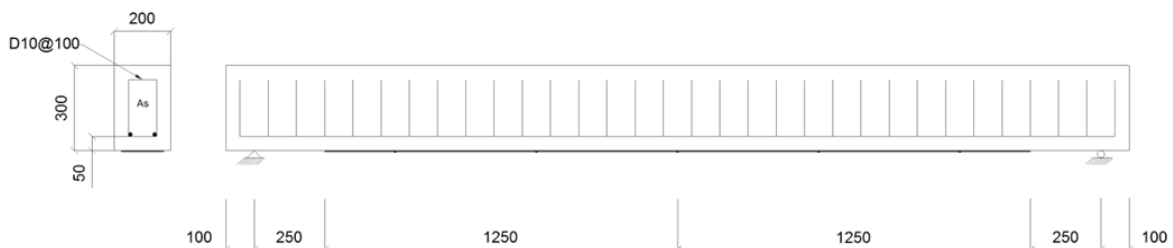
Geometry and Cross Section of the Strengthened RC Specimen (Units: mm)
